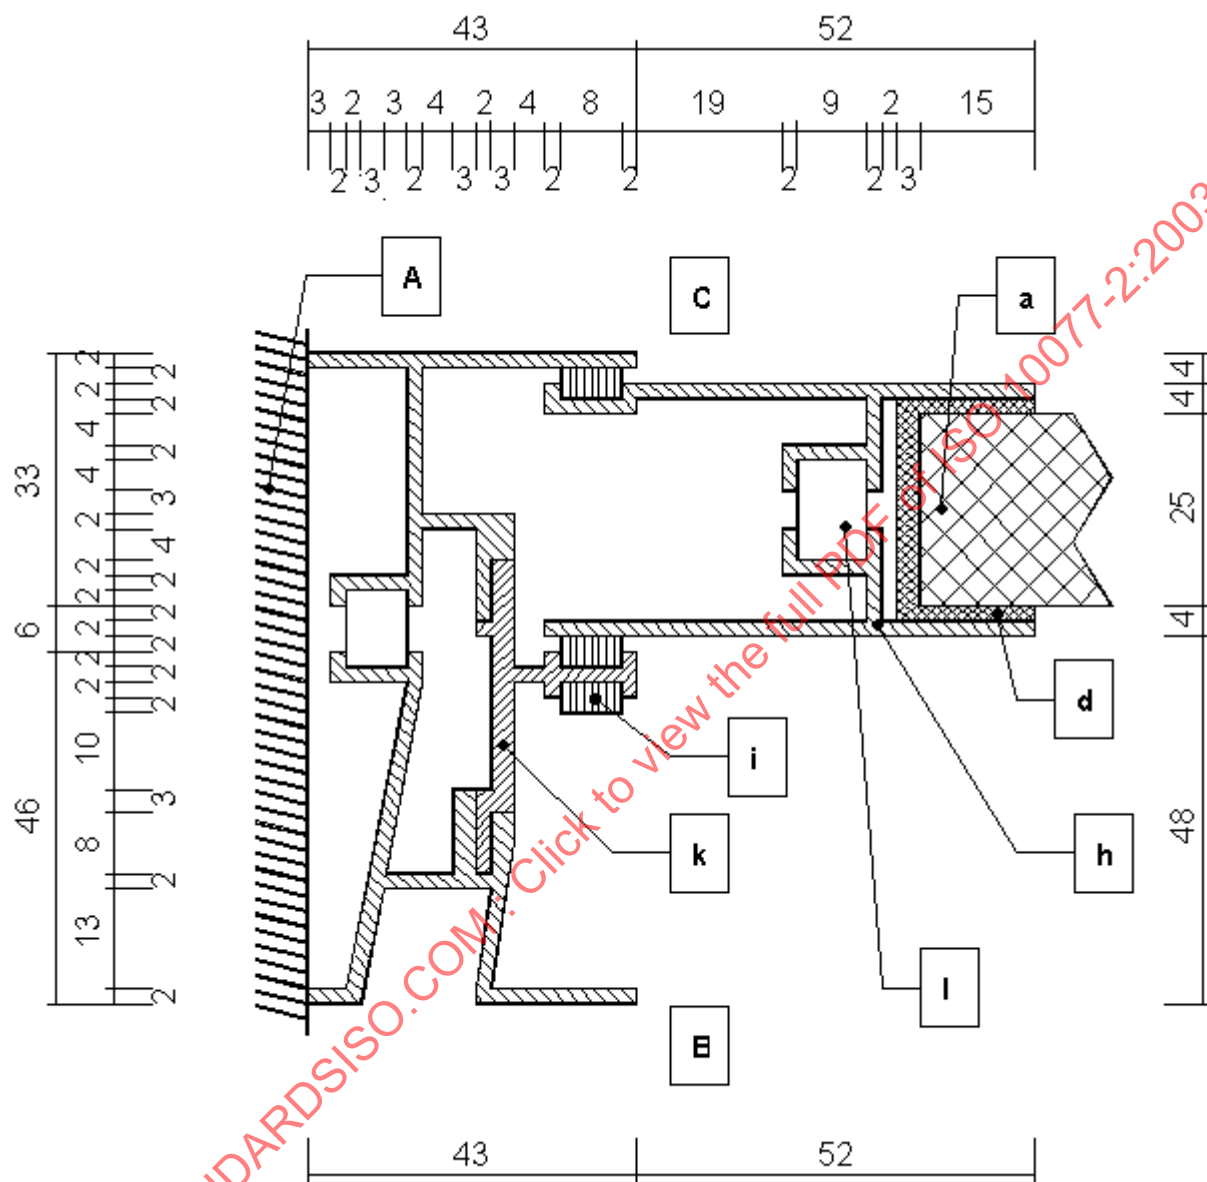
Sliding window frame section and insulation panel ($b_f = 95$ mm)
